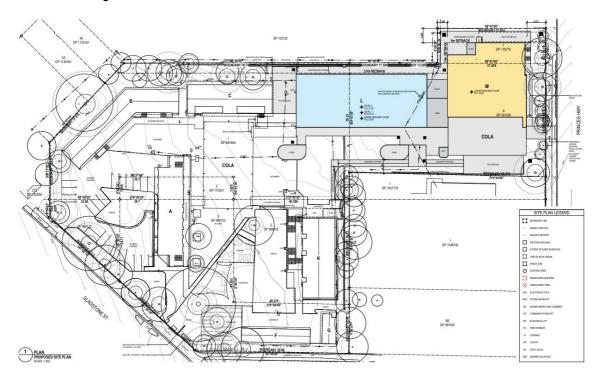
Extract of proposed Site Plan (Fulton Trotter, 2024)
